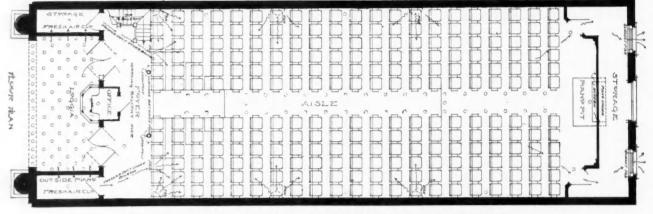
Floor Plan showing Also Arrangement of Lights and of Ventilators
